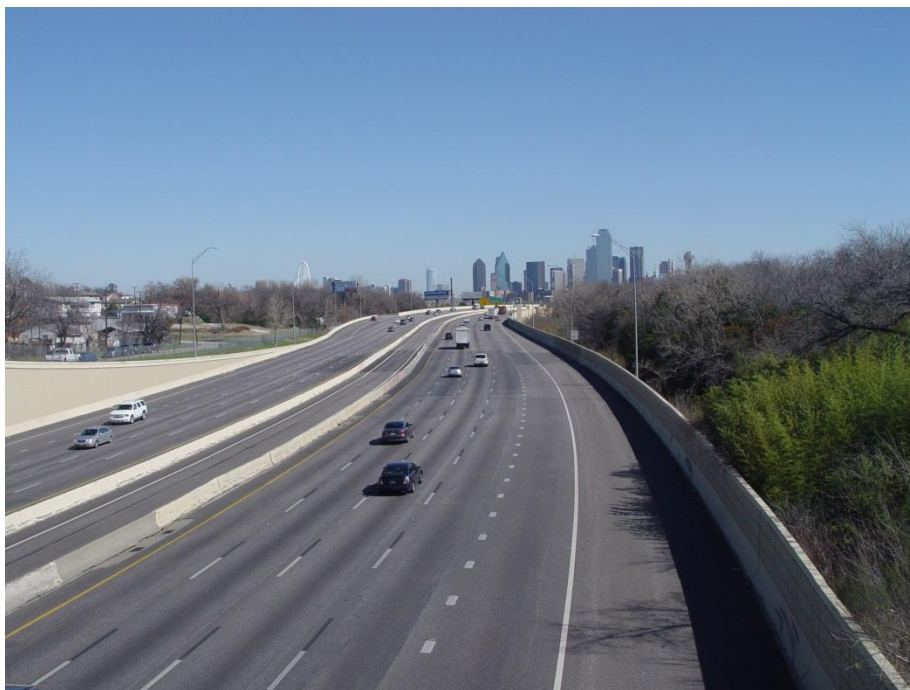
View of I-30 towards the east from Edgefield Avenue Bridge, showing the south-side concrete wall on the right (Site 1)
